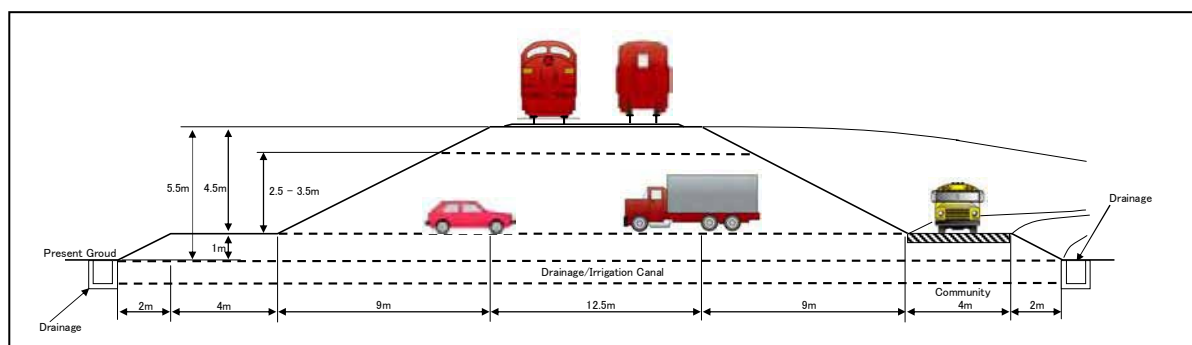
Suggested Typical Cross Section of Detour Routes
